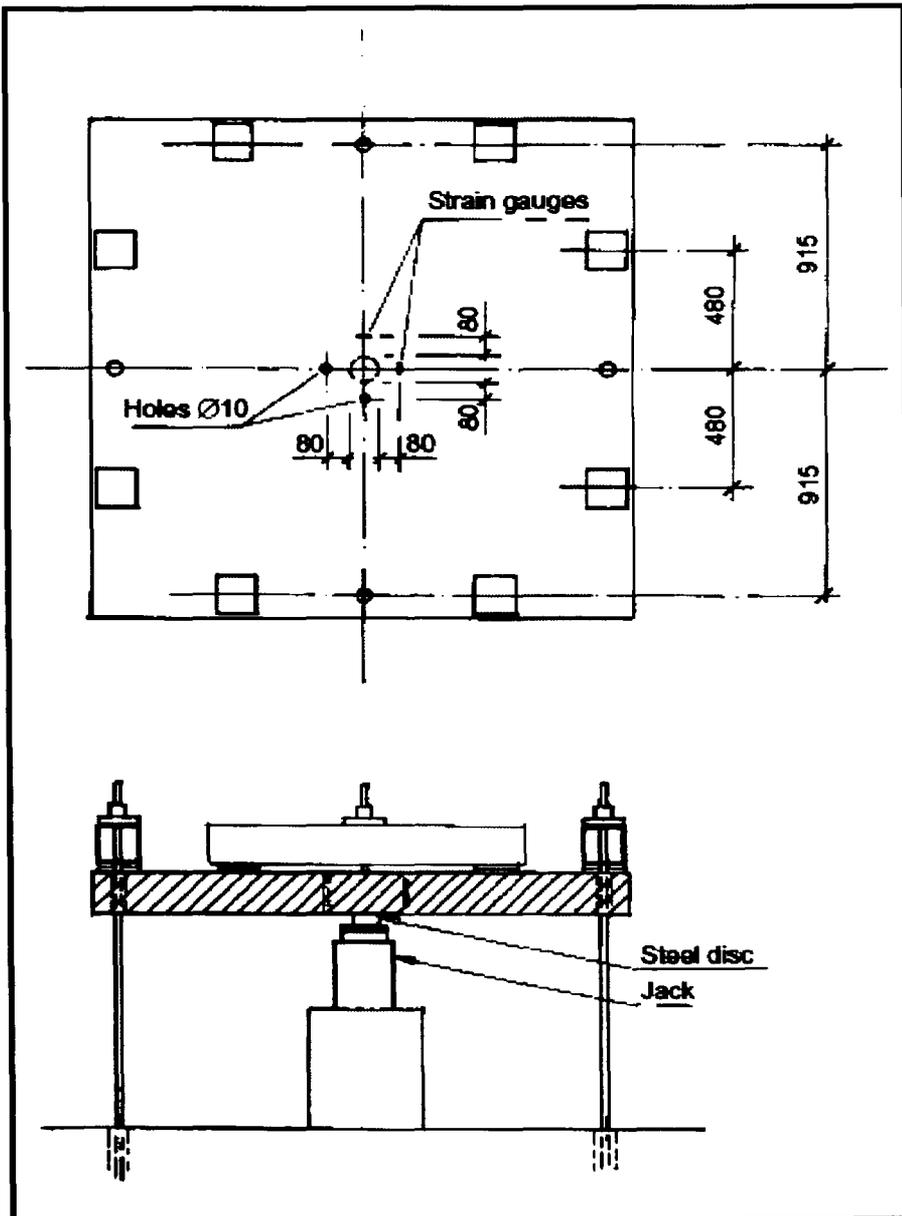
Punching shear test Arrangement (Regan 2003)
